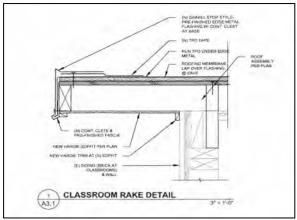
Structure 1 – Snipping of Detail 1/A3.1 Classroom Rake Detail
